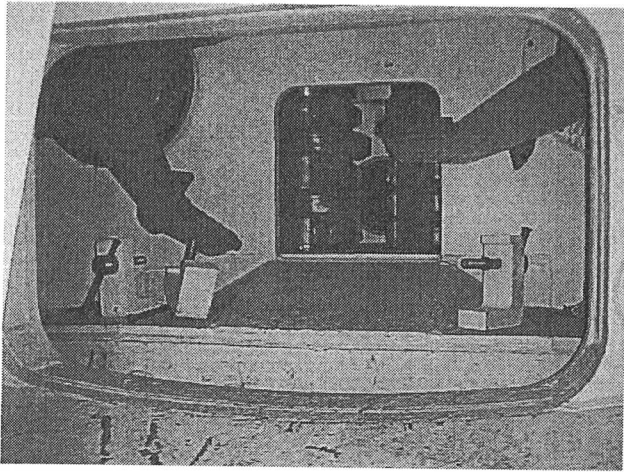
Submerged wall opening with agitators, stone crushers and suction inlet.
